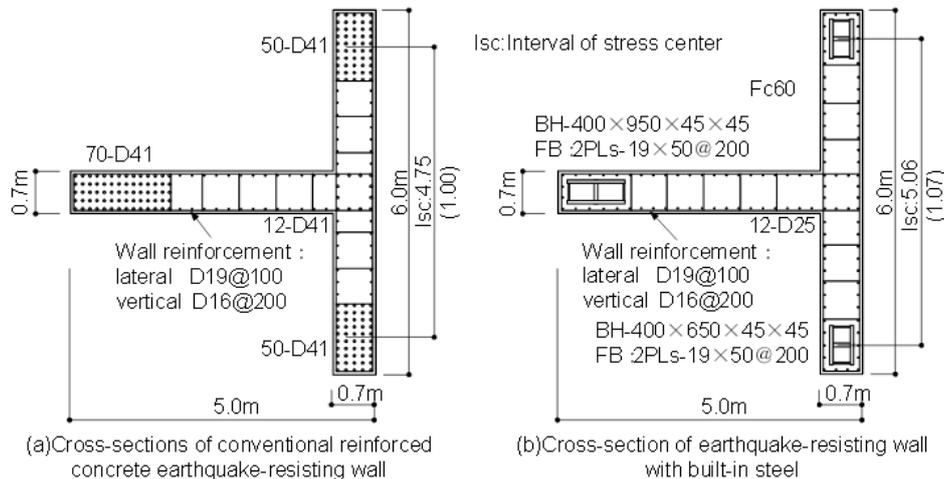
Conventional reinforced-concrete wall and earthquake-resisting wall with built-in steel
